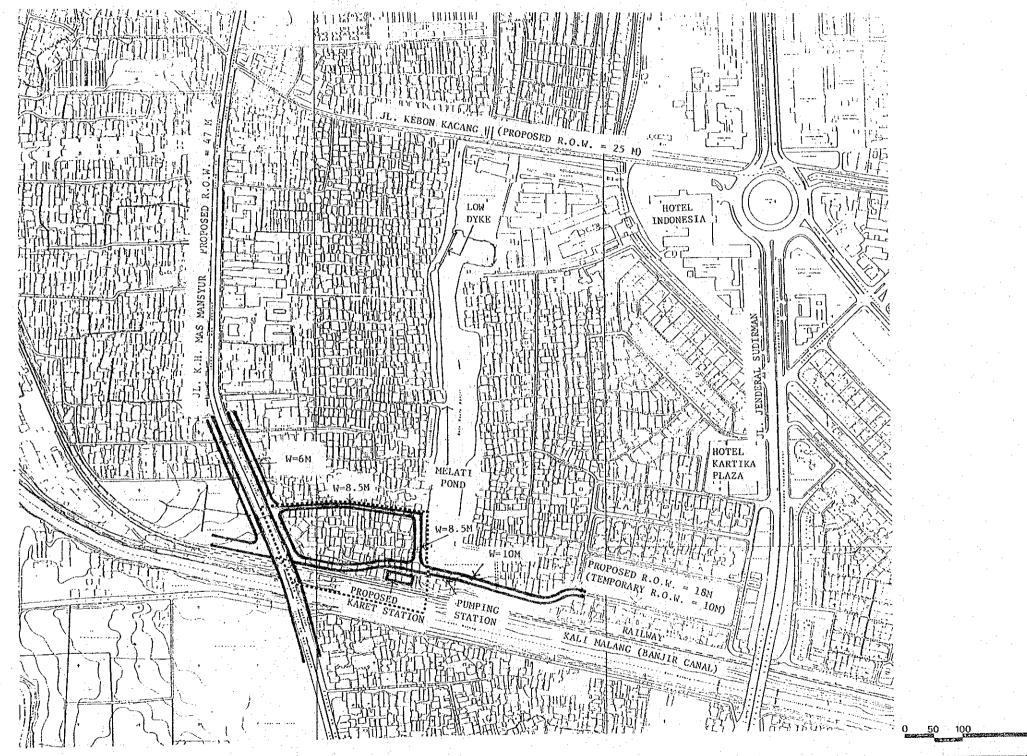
PROPOSED ROADS AND THEIR CONNECTIONS - KEBON MELATI
